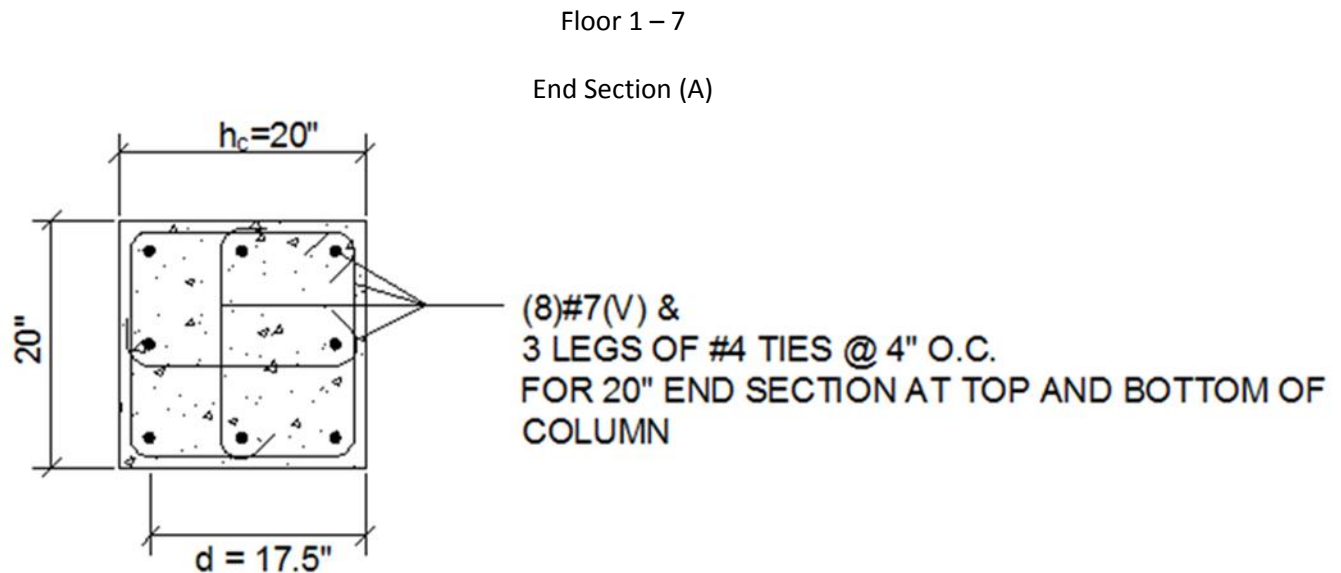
Interior column, cross-section end of column at all floor levels based on SDC D design.
